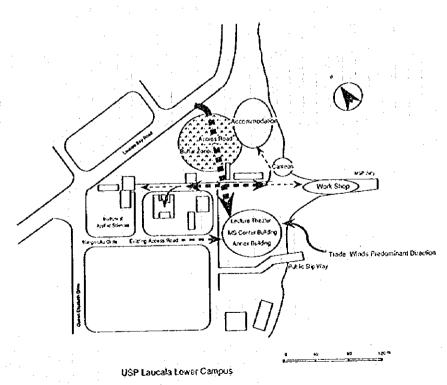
Layout Plan for the MS Complex Facility
